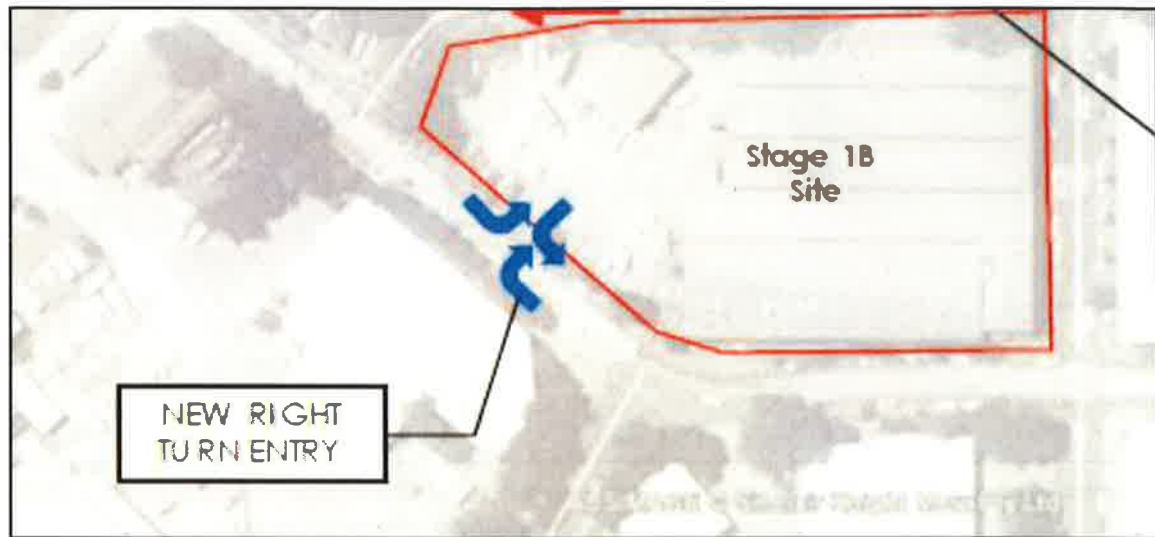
| New right turn into the parking ramp on Edinburgh Road (Source: Proponent's EA)
